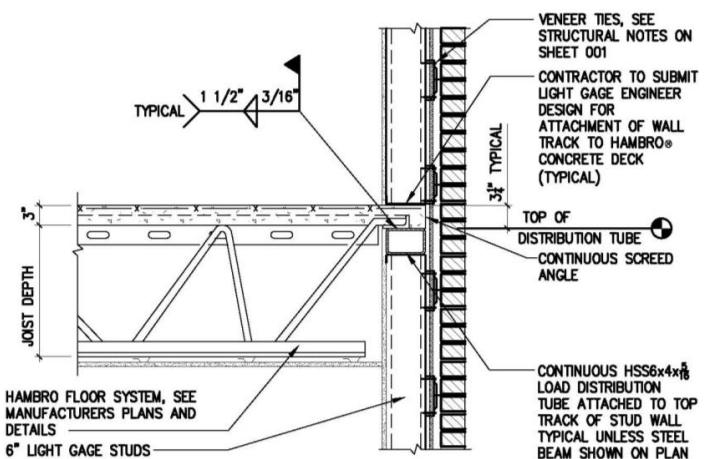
Exterior wall framing details. Source: Construction documents by Cates Engineering.
